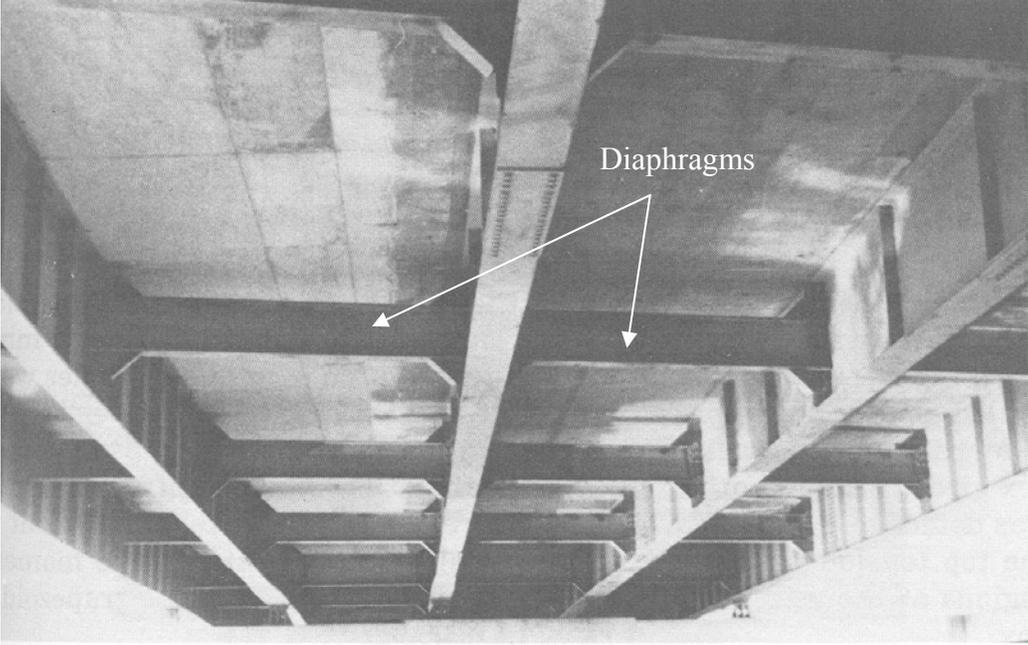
Diaphragms and transverse stiffeners on steel girder bridge (Fisher 1984)
